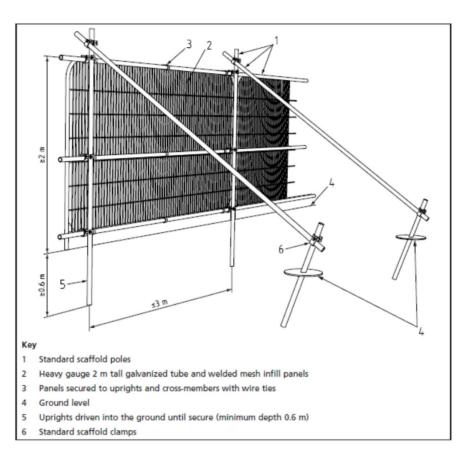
Tree Protection Barrier Specification (Source: Figure 2 from BS5837 - Default specification for protective barrier)
